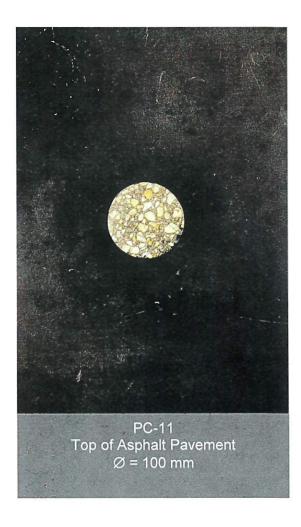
Specimen from Ellice Avenue, Westbound Curb Lane
